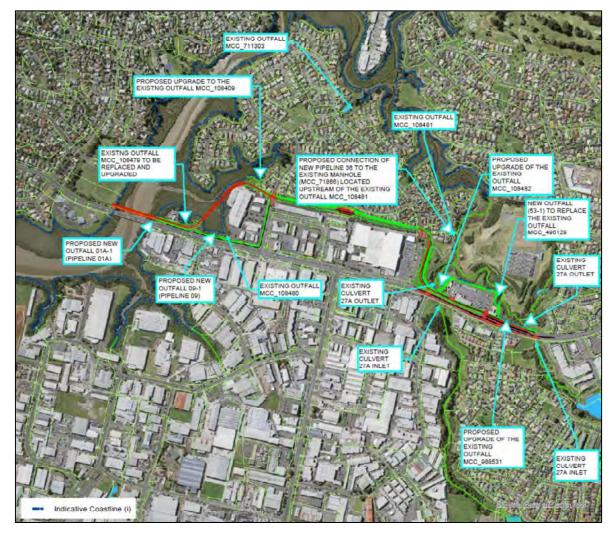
EB3C Stormwater Outfalls (Existing and Proposed)
